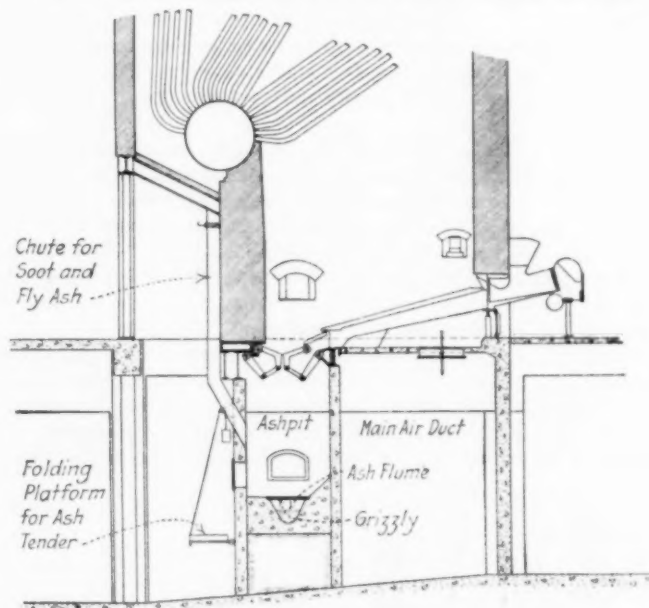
WATER CONVEYOR AT LACOMBE STATION, DENVER. CROSS-SECTIONAL ELEVATION
